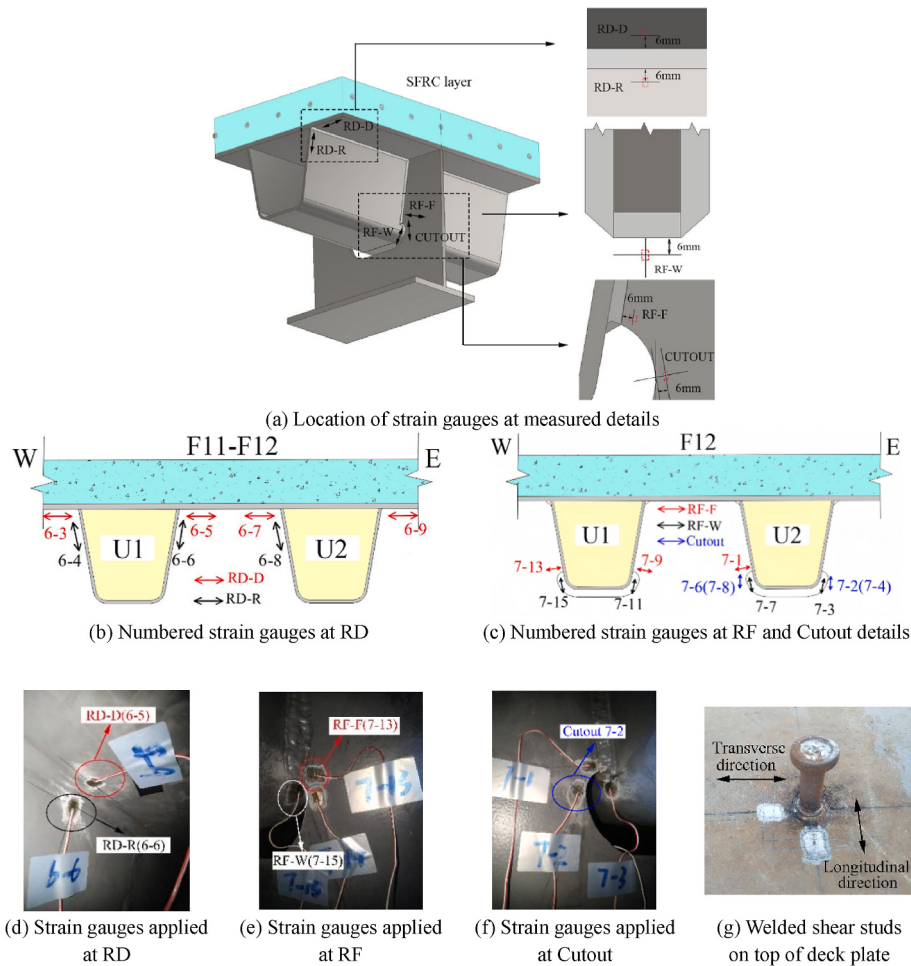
Strain gauge arrangements at details of OSDs and their installation photo on real bridge.
